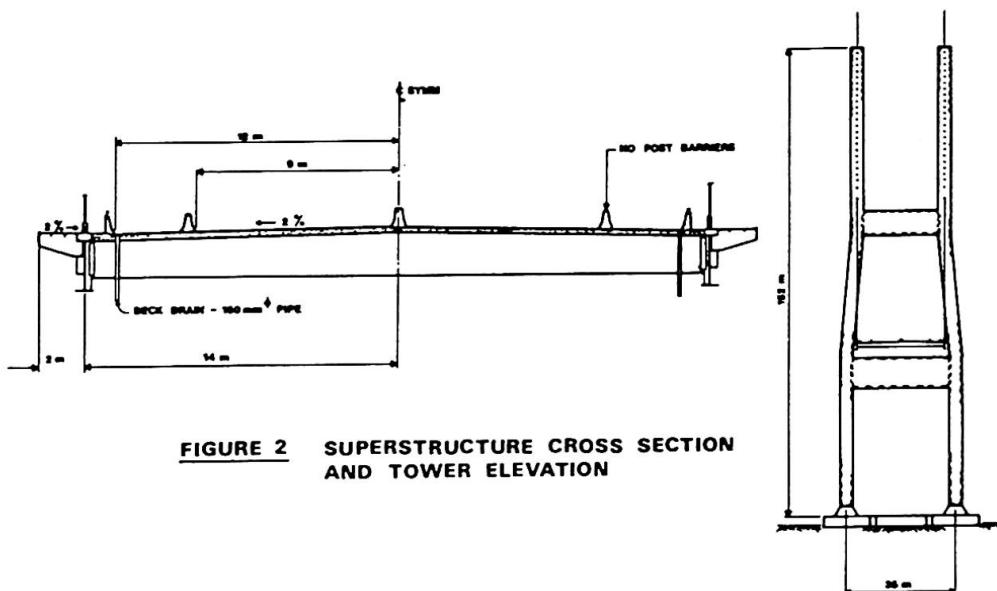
SUPERSTRUCTURE CROSS SECTION AND TOWER ELEVATION
